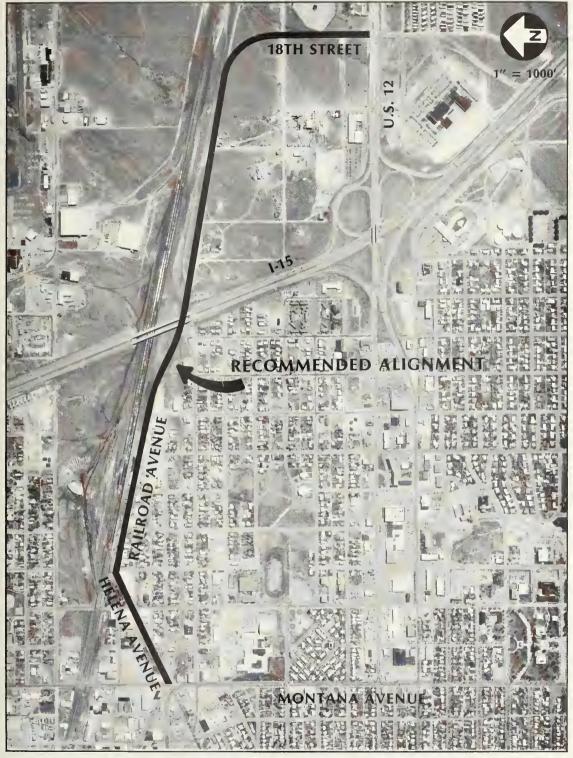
RAILROAD AVENUE EXTENTION TO U.S. 12
